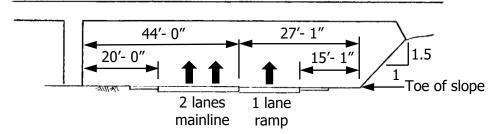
Bridge elevation view of horizontal clearances for highway feature carrying mainline and ramp traffic below the bridge.
